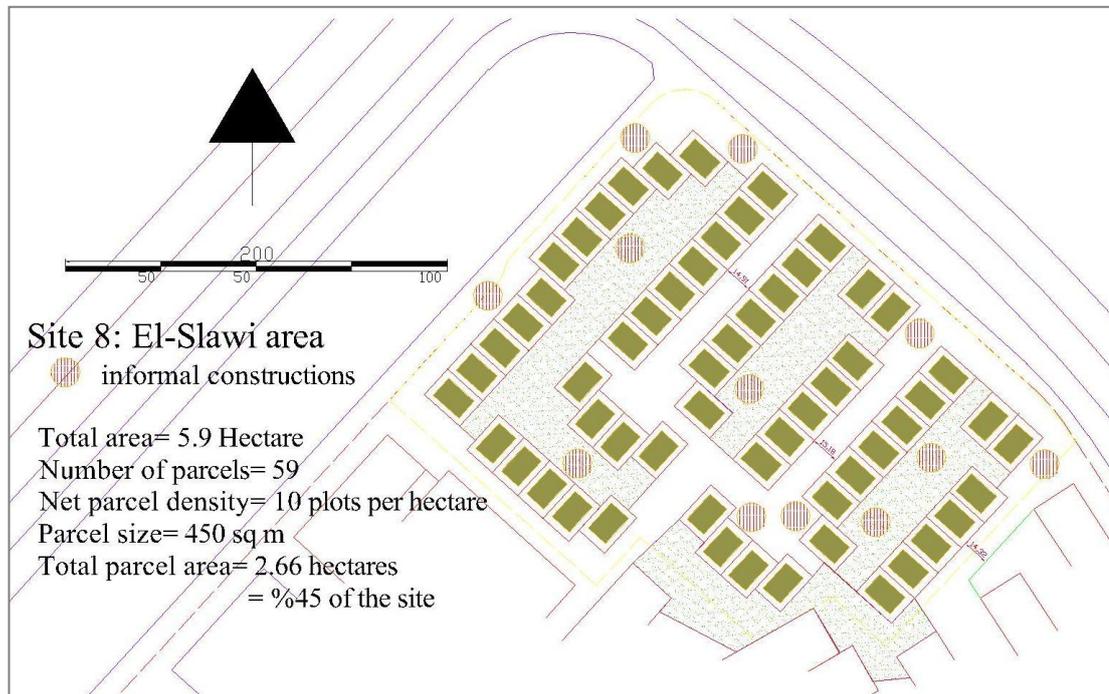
26: Layout Plan, Site Eight- El- Slawi Area
